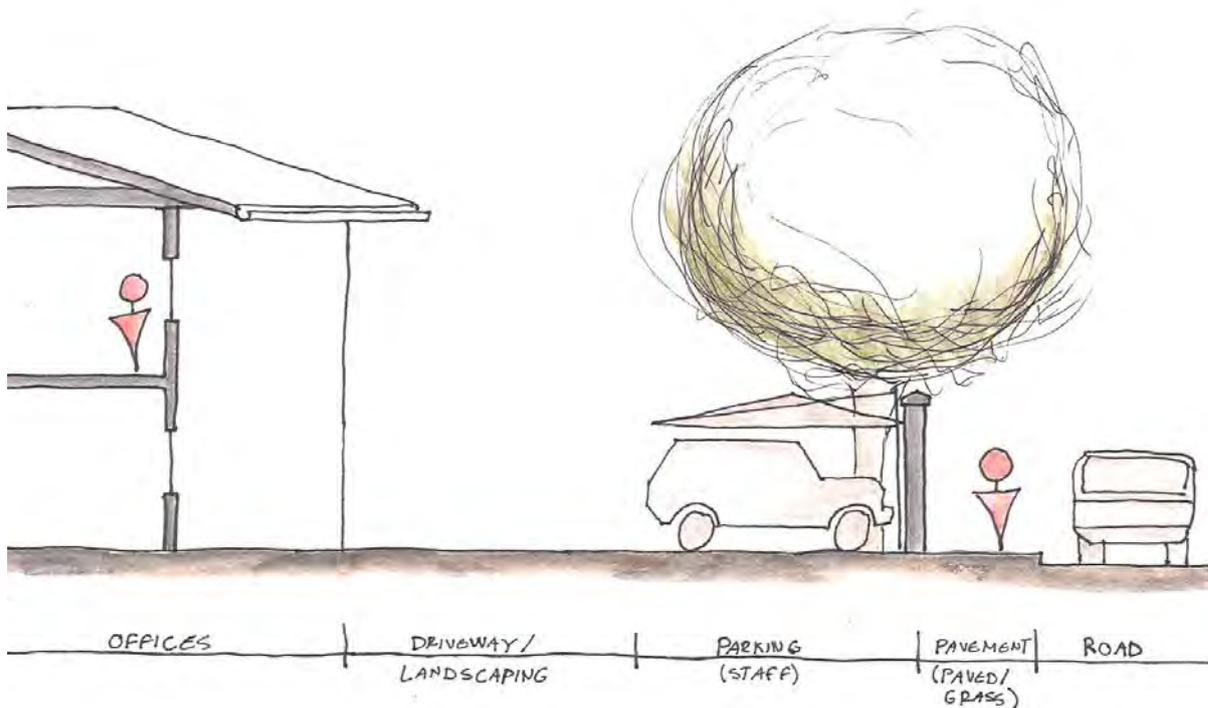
A typical section of how offices in Hillcrest and Kloof address the street. Some offices are completely hidden from the street by trees. Walls and fences, and parking and landscaping separate the pedestrian from offices, creating a hostile street environment for the pedestrian (Author: 2011).
